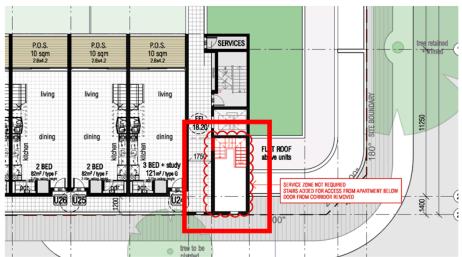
Proposed Storage Area replacing services on Level 4 (third floor)
